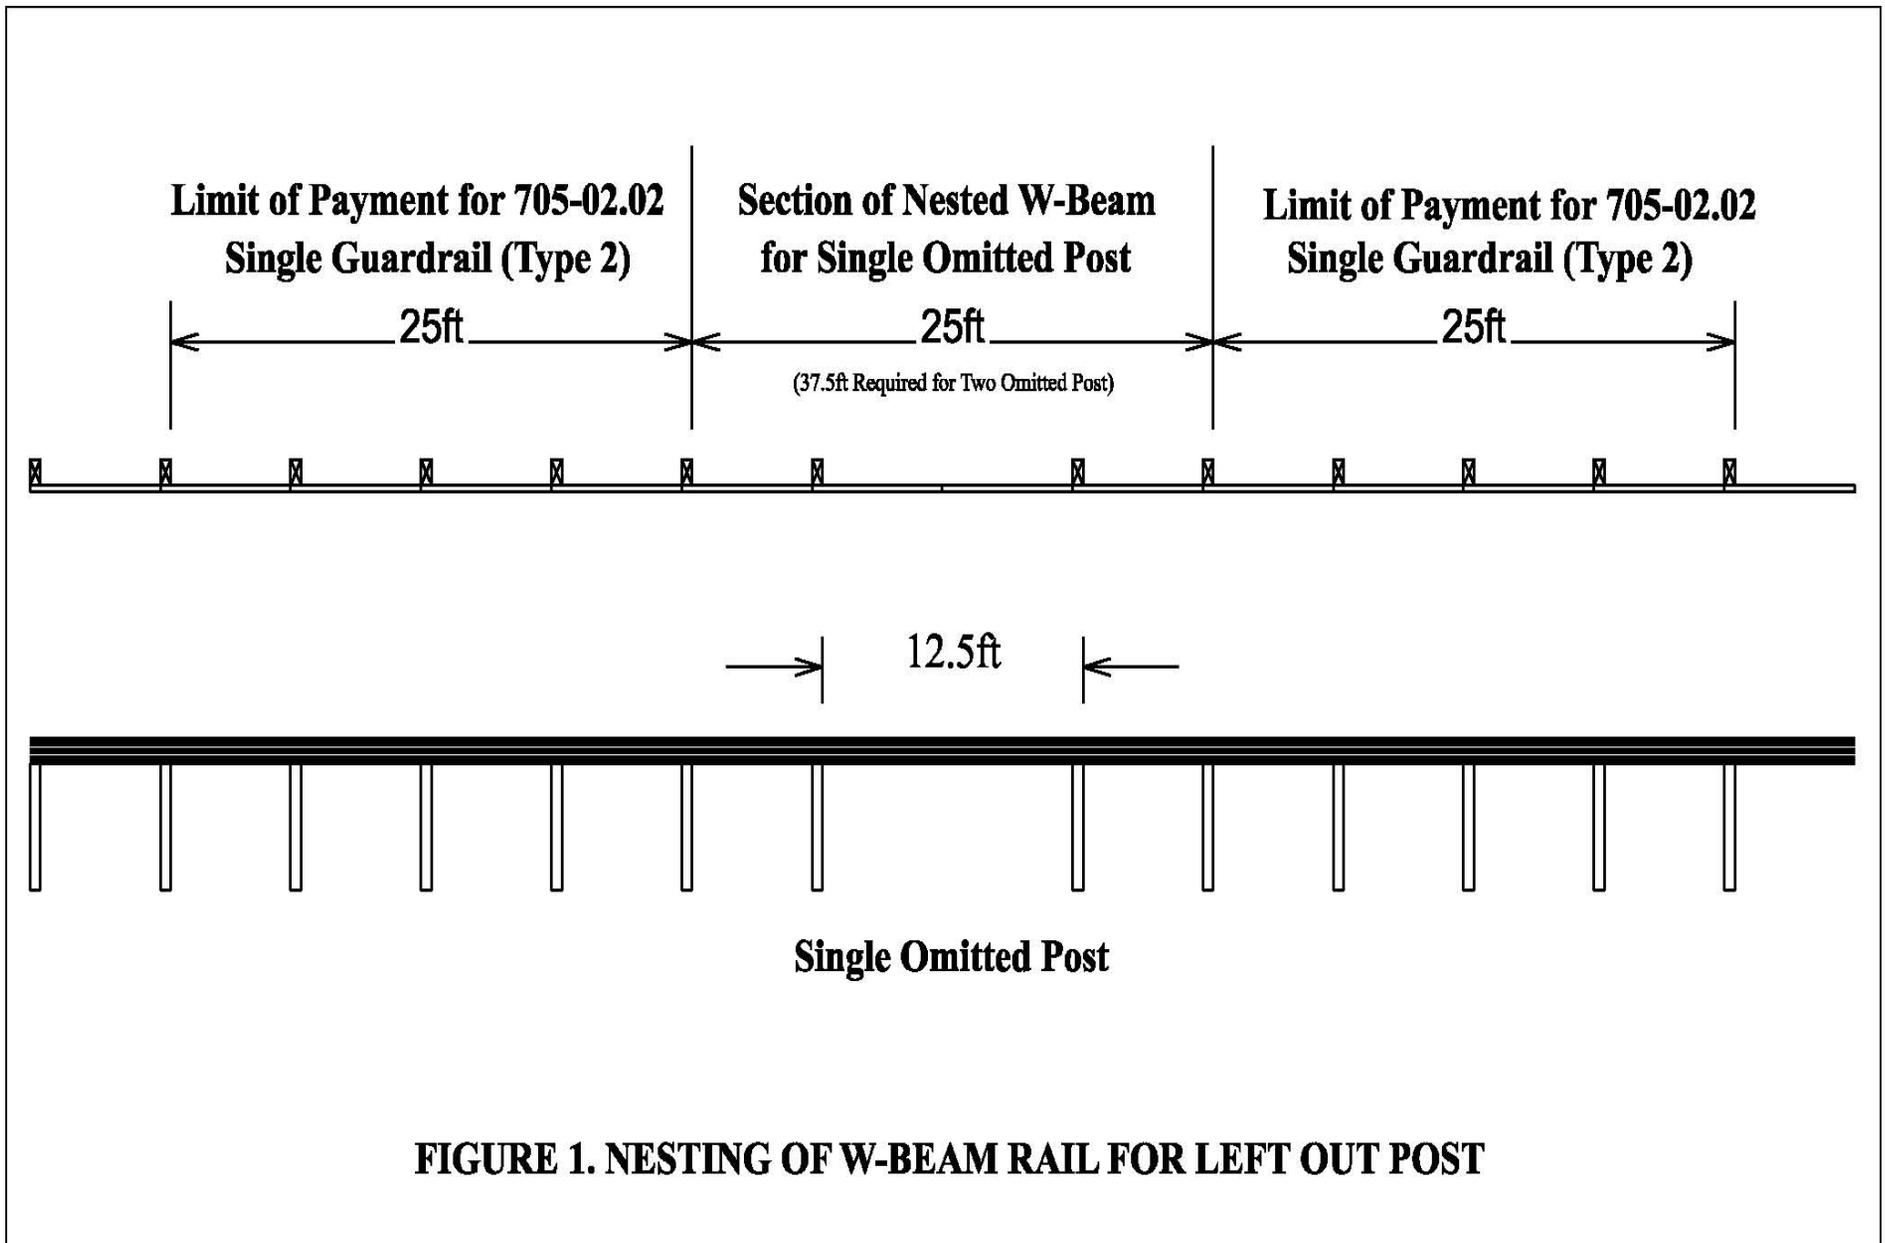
NESTING OF W-BEAM RAIL FOR LEFT OUT POST
